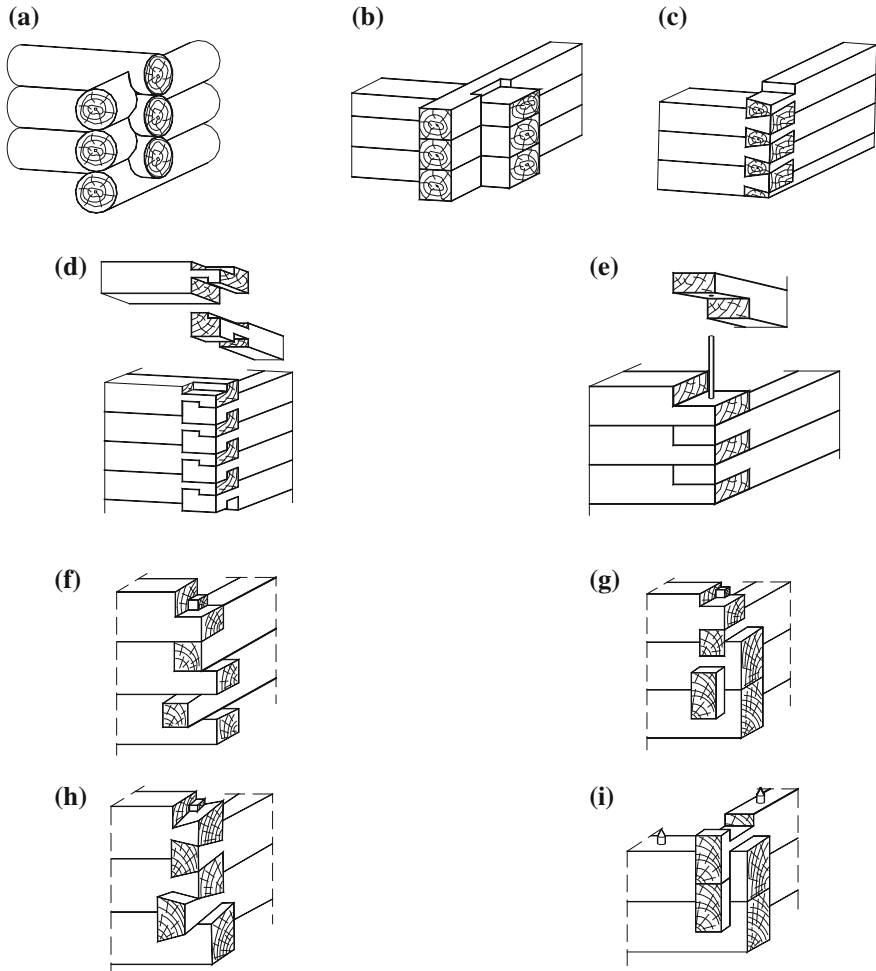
Connections of perpendicular walls from beams laid horizontally [3], a saddle framework corner joint, b lap, c lock on “zincs”, d “lock” joint, e corner reinforced with a bar, f framework joint with tendons, g notches with undercuts and tendons, h slanting notches and studs, i connections of logs using notches and studs
